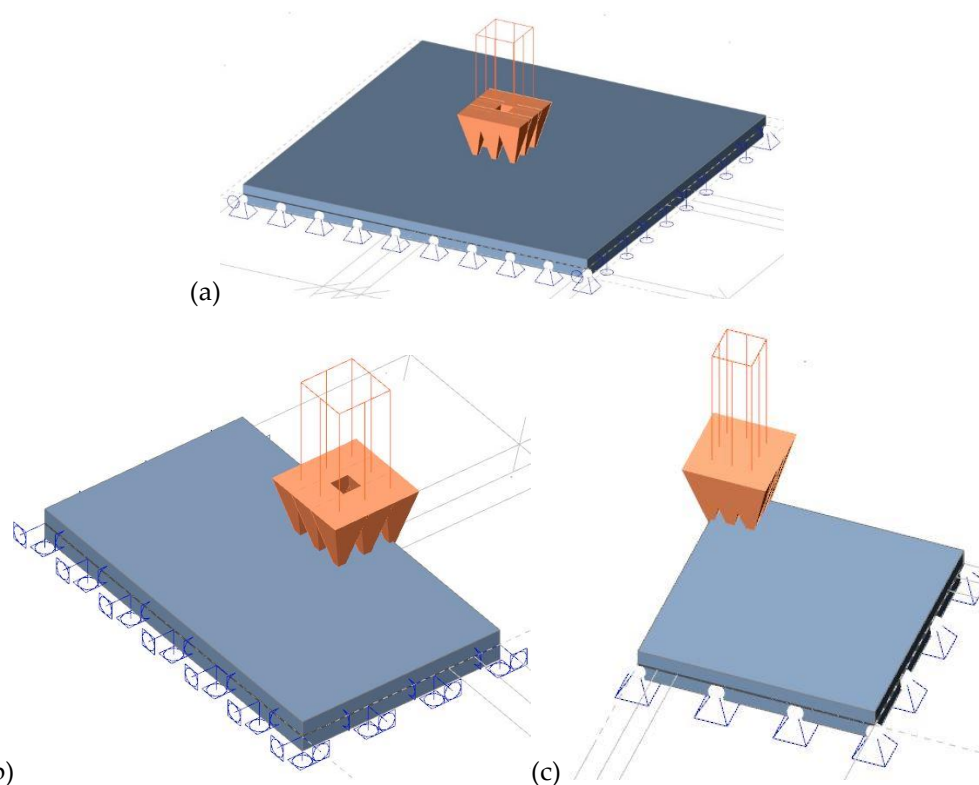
Slab geometries and test slab-column connection: (a) square interior slab-column connection [2]; (b) rectangular edge slab-column connection [16]; (c) square corner slab-column connection [17].
